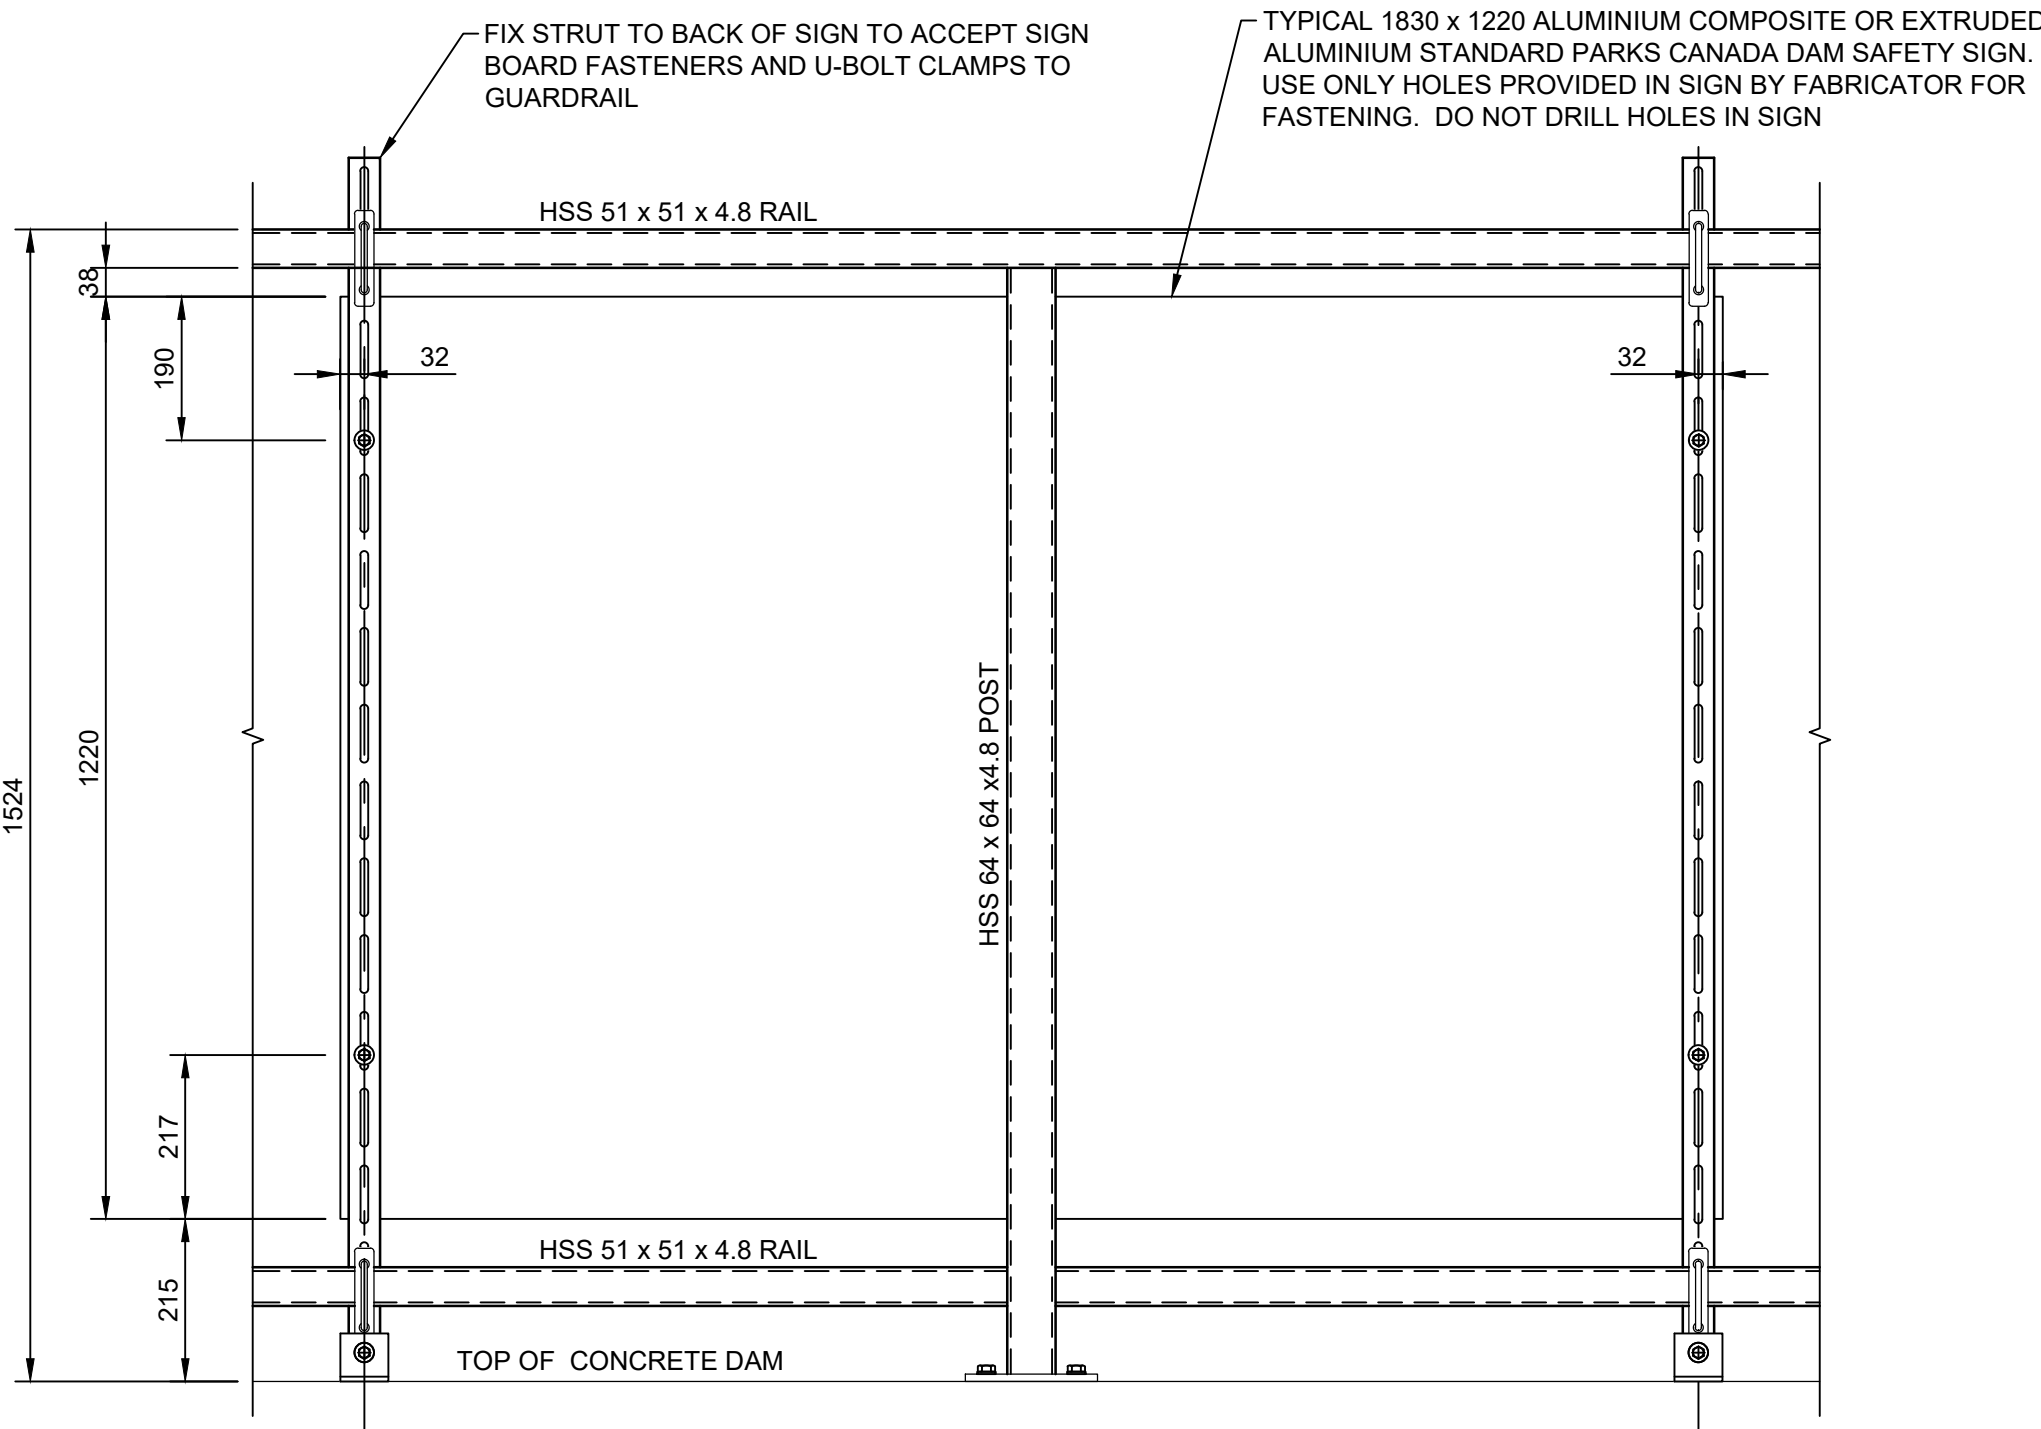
HIGH GUARDRAIL DETAILS
